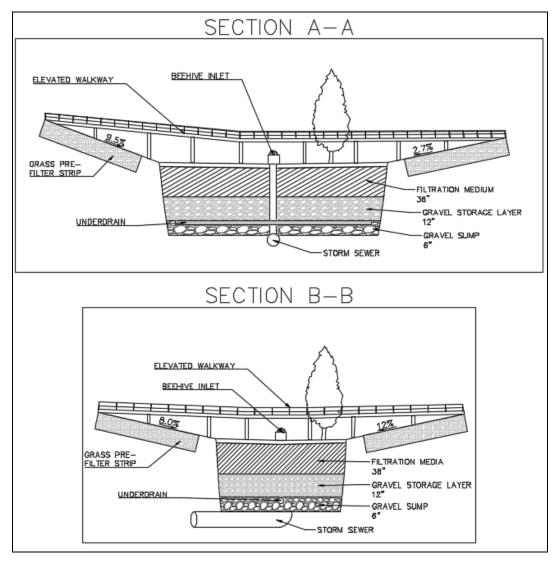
Cross sections of the bioretention basin. Section A-A shows a view cut along the basin length and section B-B shows a view cut along the basin width. Grass pre-filter slopes are typical for the lawn around the basin.
